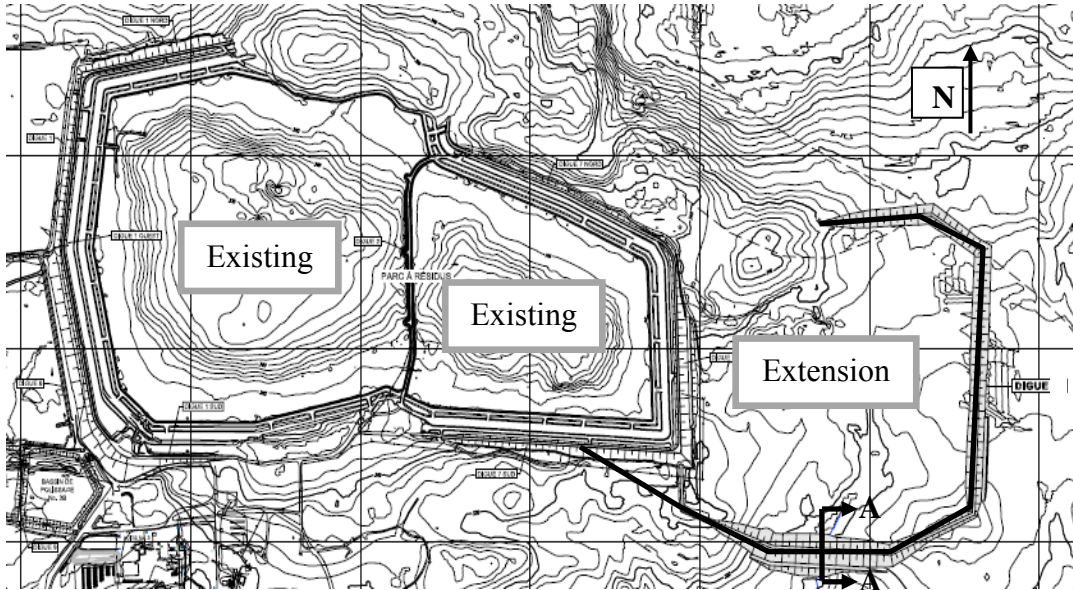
Tailings impoundment expansion site layout. Cross-section A-A refers to area of study.
